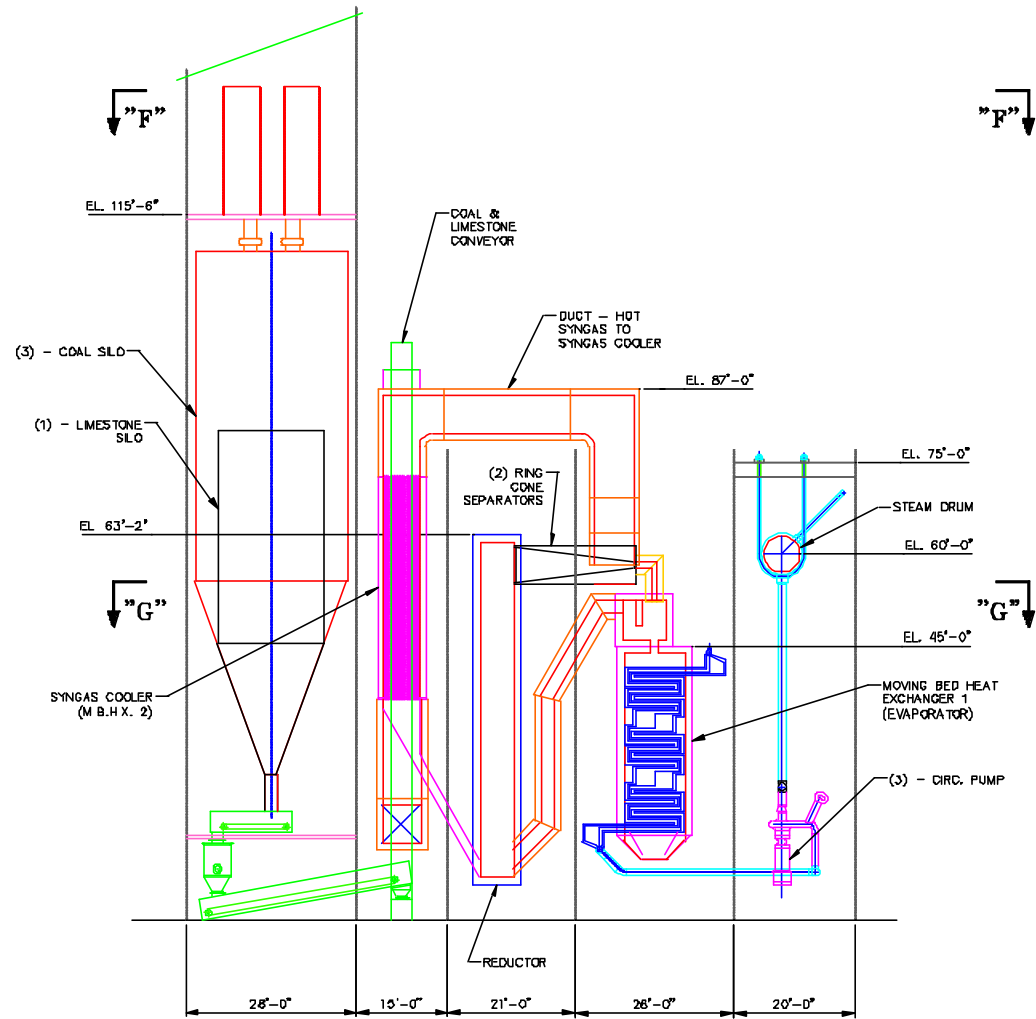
3: Case-12 Gasifier Island General Arrangement Drawing – Side Elevation
